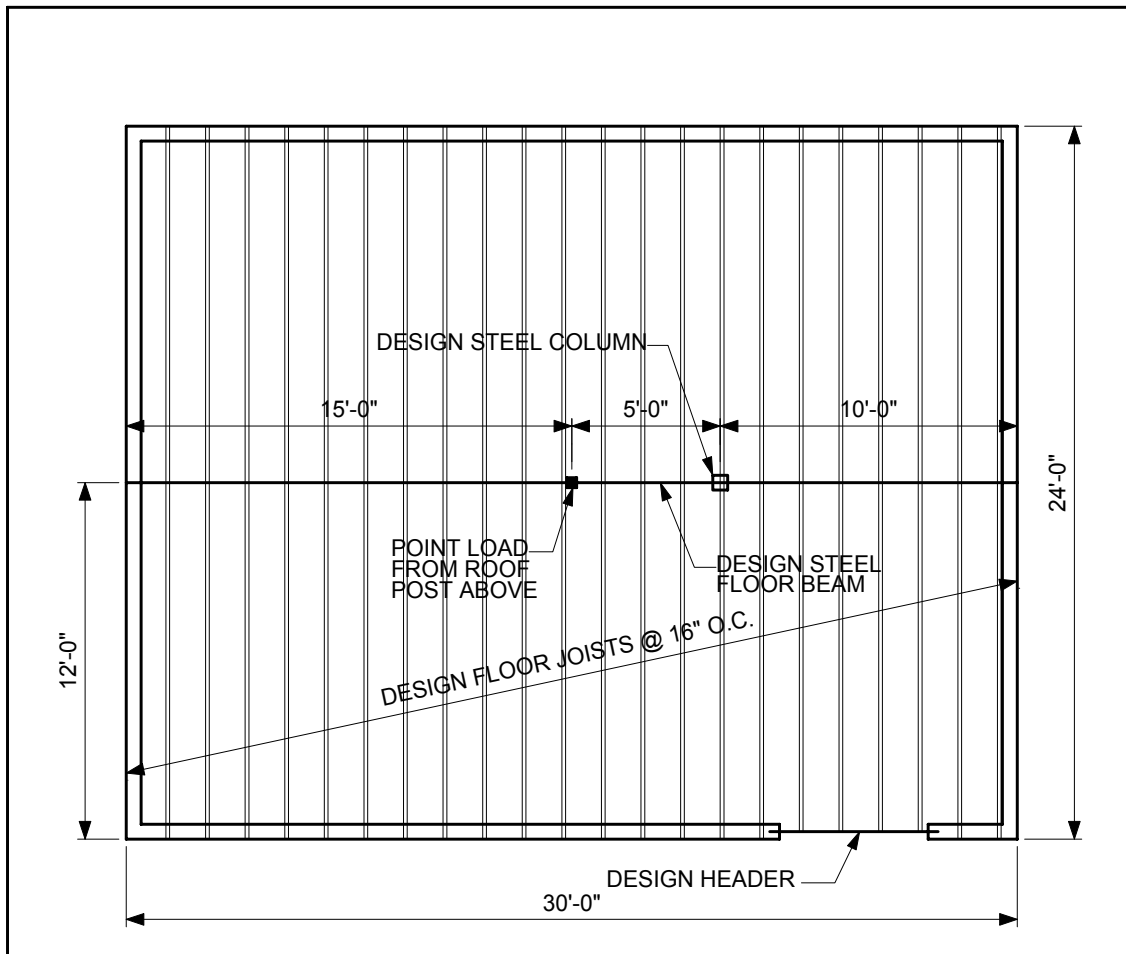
UPPER FLOOR FRAMING PLAN
